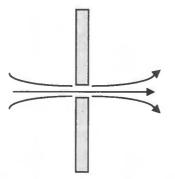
Diagram of air infiltrating through a wall crack
